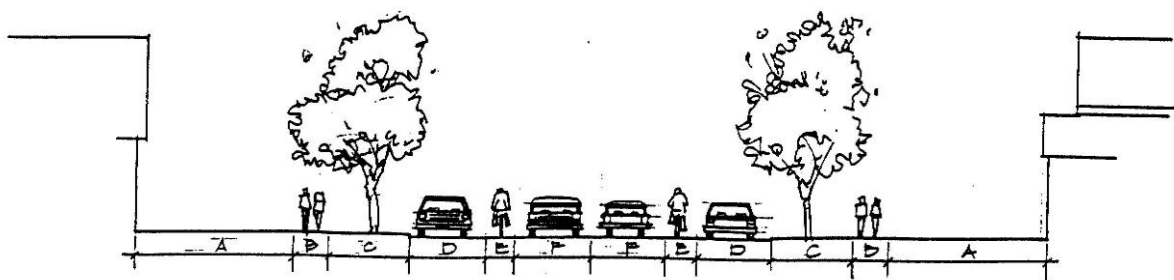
Schematic sketch of a typical collector street cross-section. Table 1 lists the recommended dimensions of each component: A) building setback from street right-of-way; B) walkway; C) planting area; D) parking lane; E) bicycle lane; F) travel lane.
